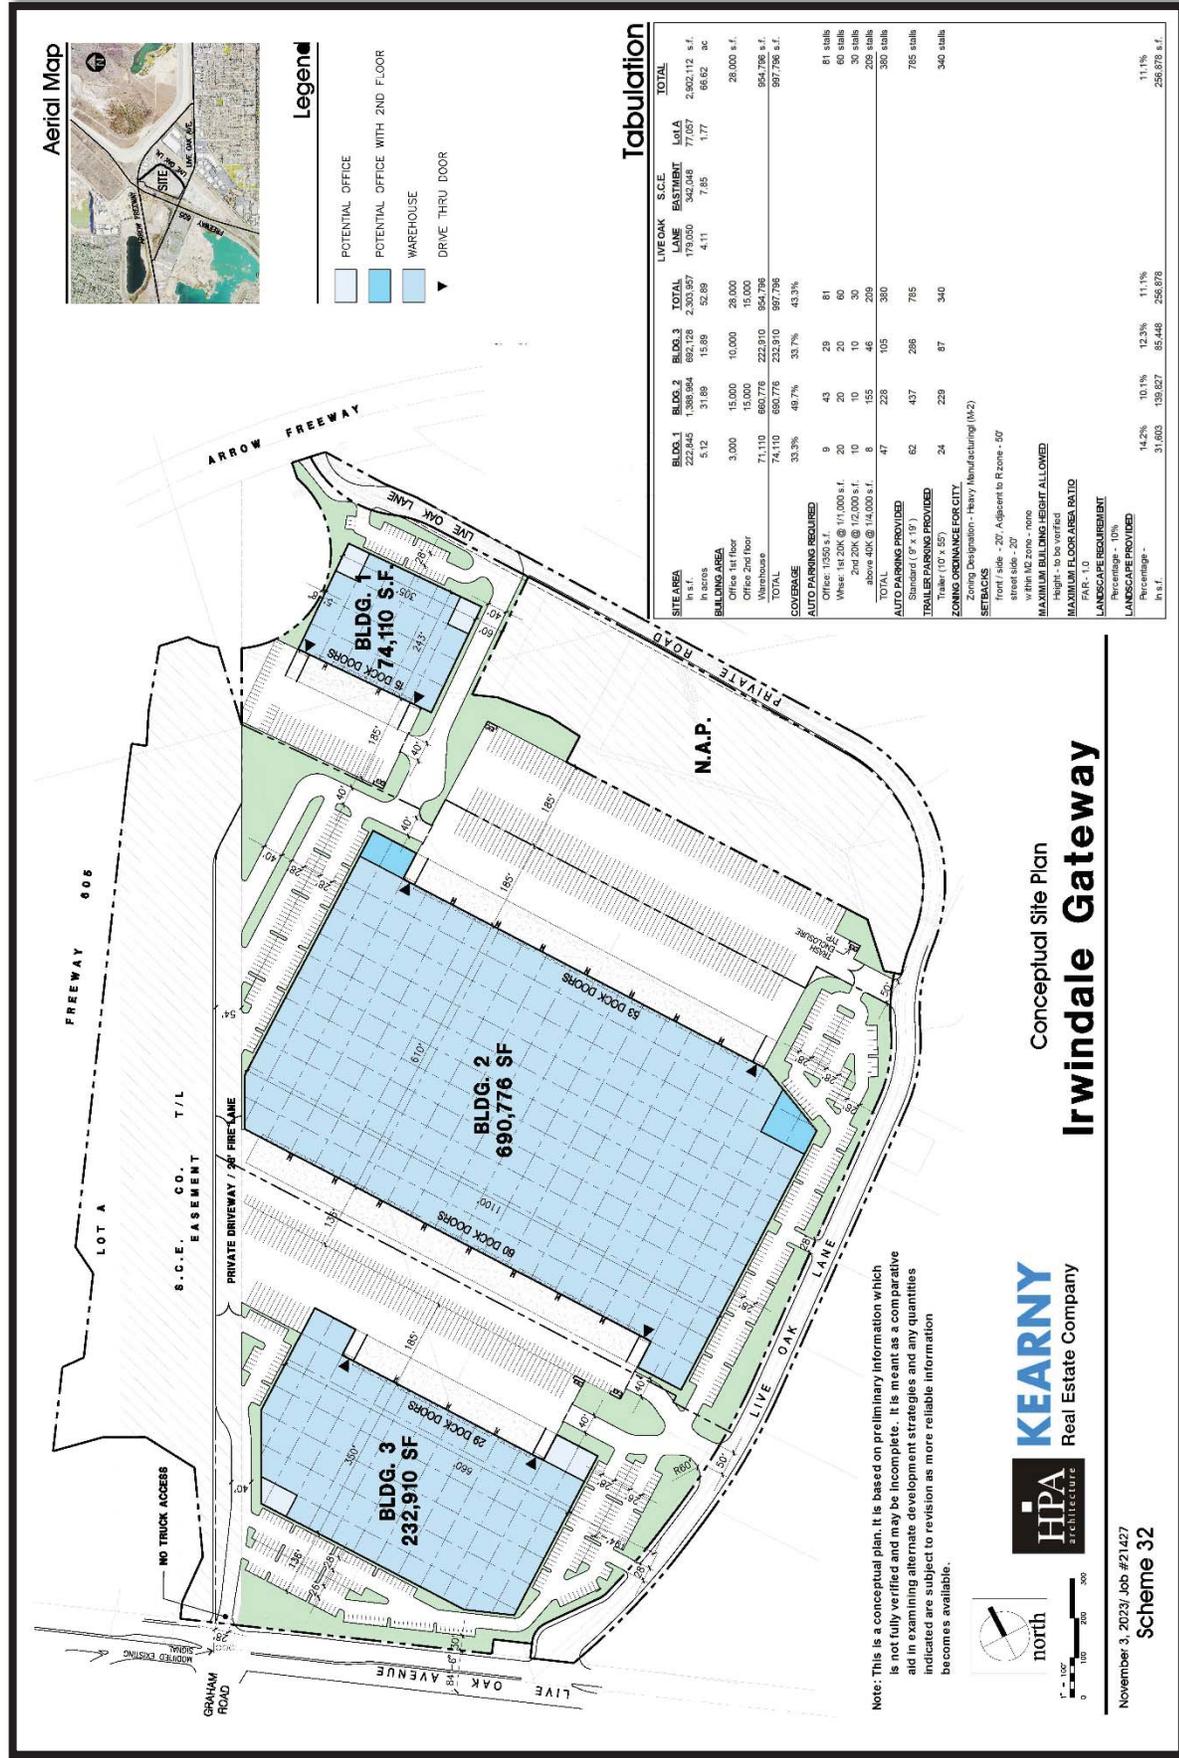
CONCEPTUAL SITE PLAN WITHOUT BESS
